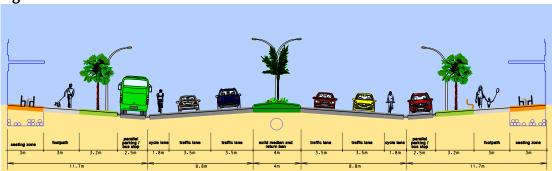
SITE LAYOUT DEVELOPMENT COMPLETE
